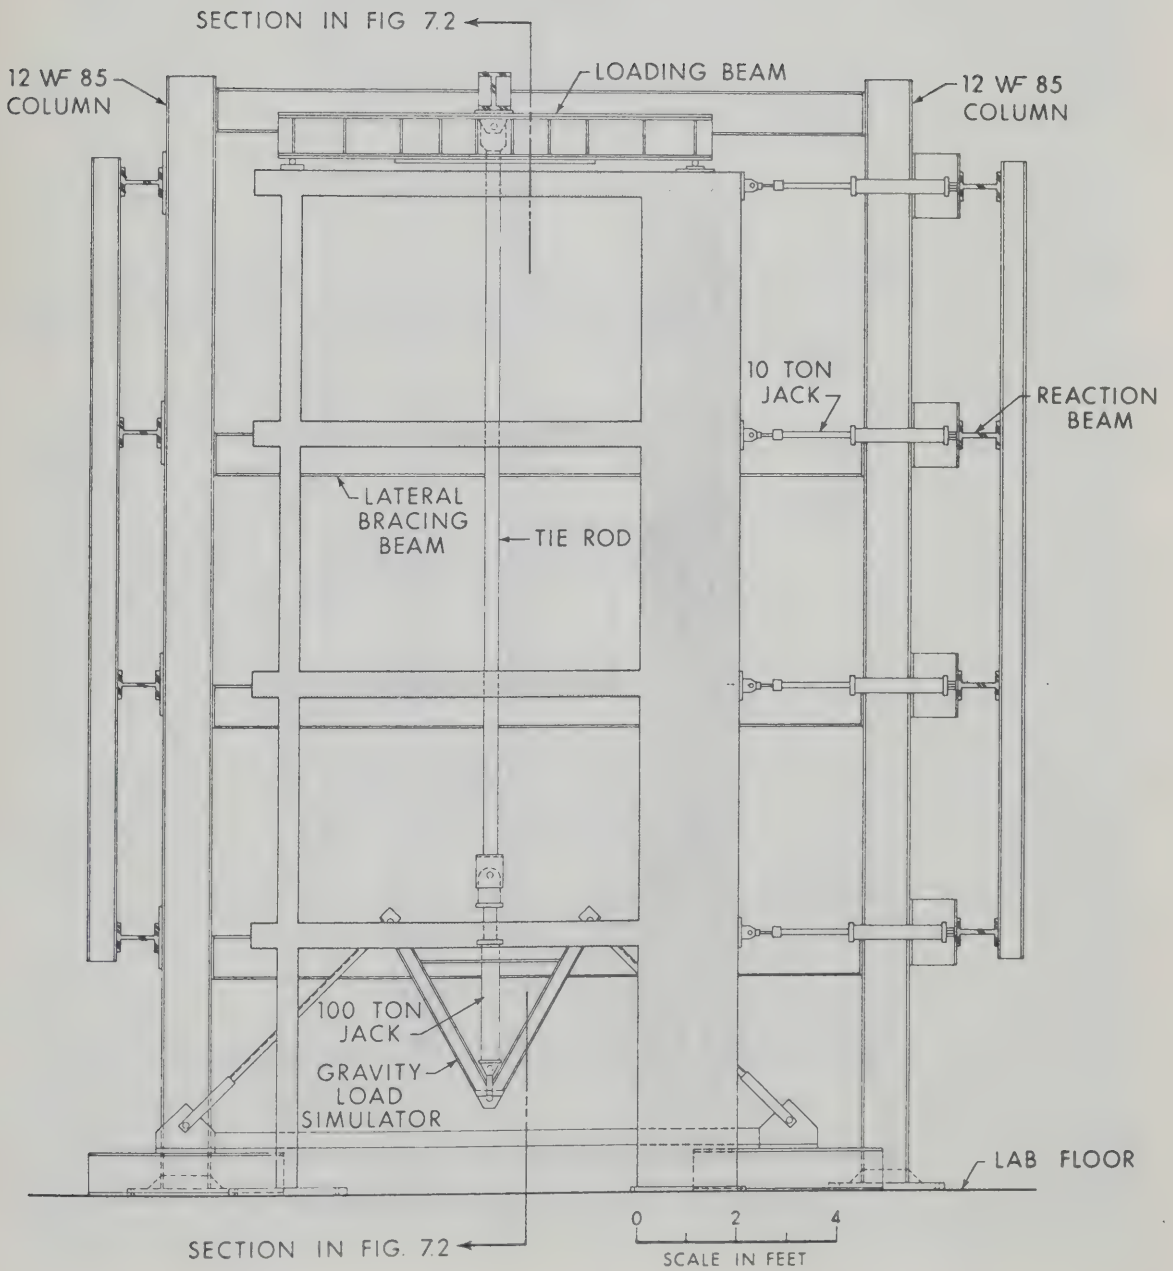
SECTIONAL ELEVATION OF TEST SPECIMEN INCLUDING
